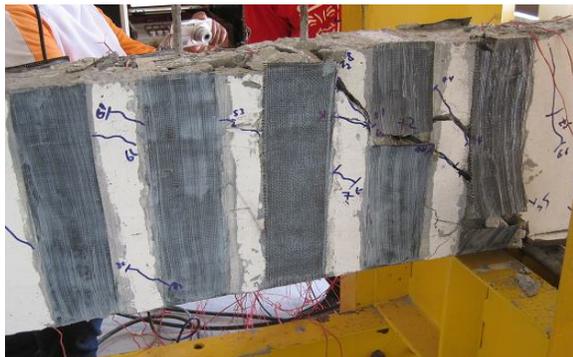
Cracking and failure pattern of beam C2.5-U-V
